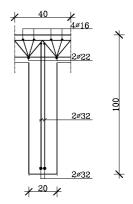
Reinforcement of the main girders in characteristic cross-sections
